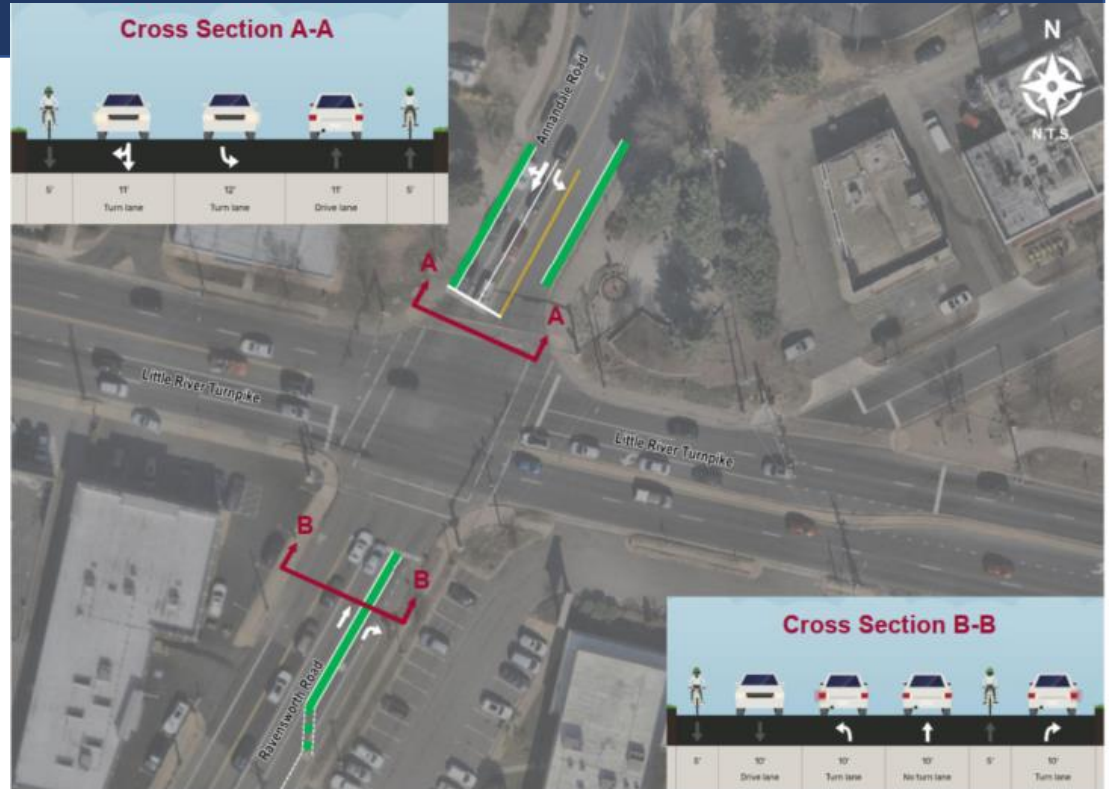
Intersection of Annandale Road and Little River Turnpike Build Conditions Cross Section and Plan View
